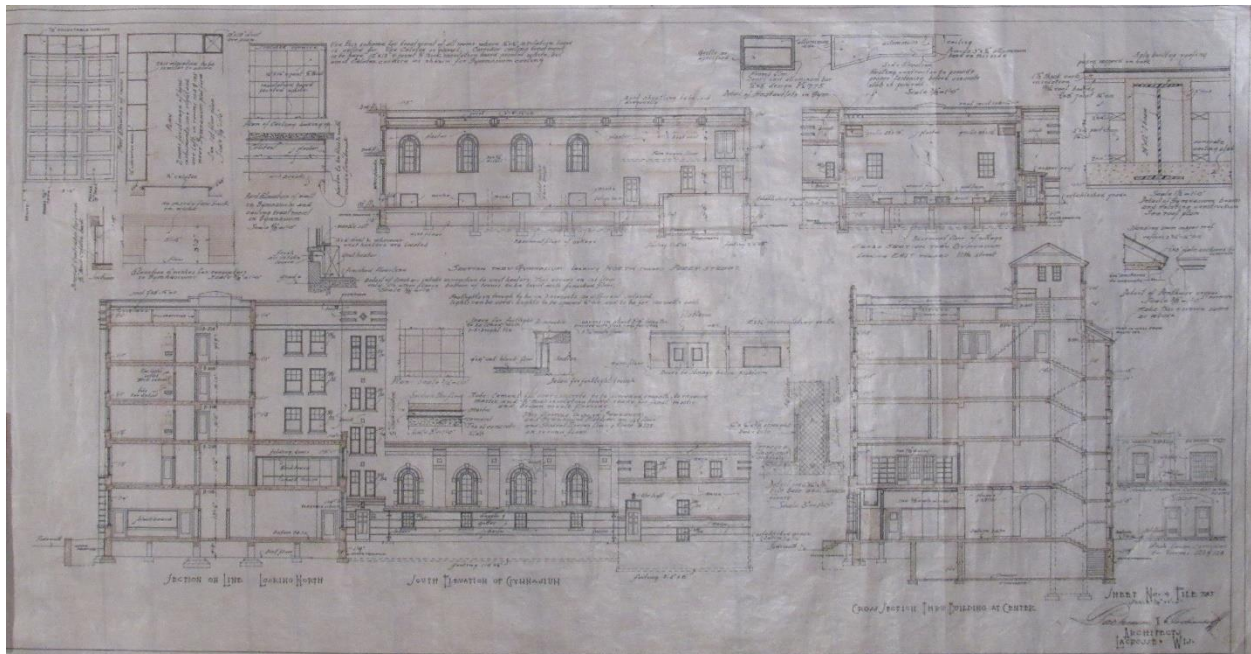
Original construction documents. “Building Sections” Sheet 4. 1 April 1941.
